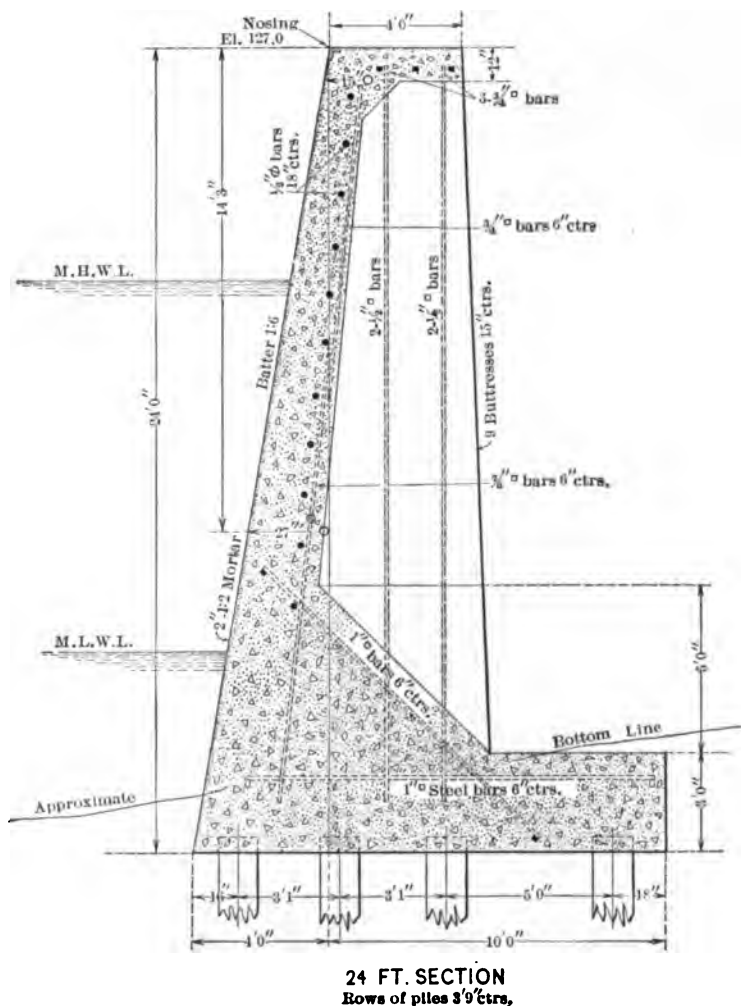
PUGET SOUND NAVY YARD, SEA WALL.
